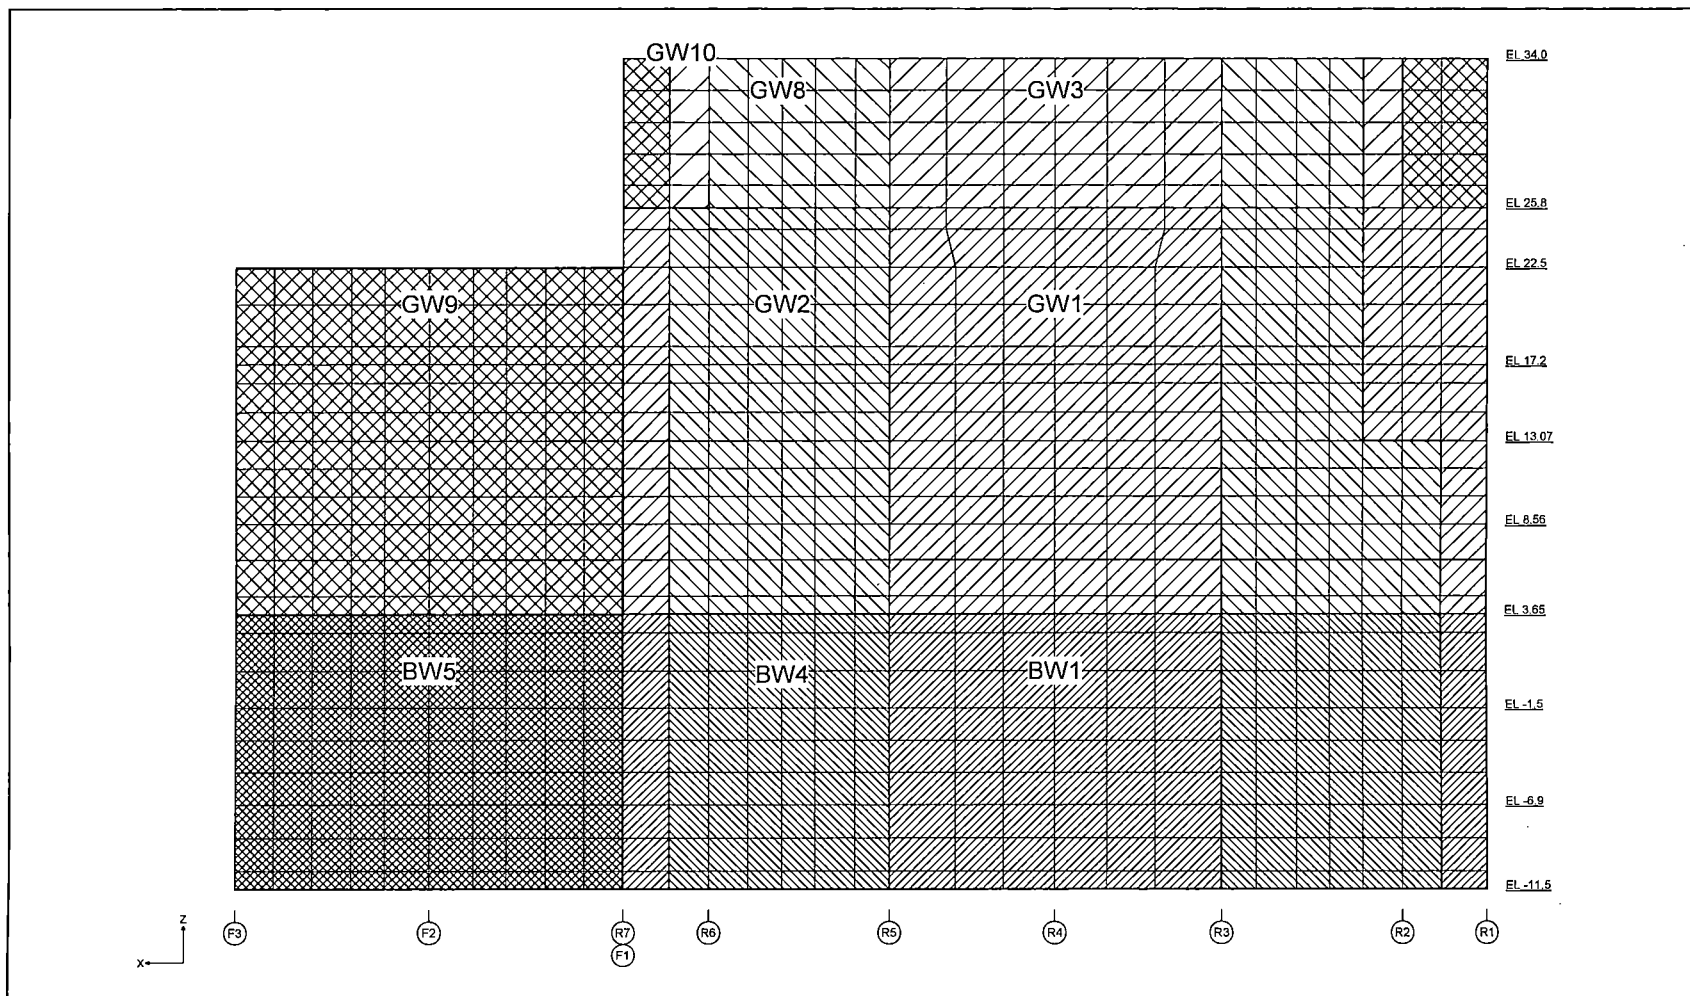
Application of Thermal Load on the External Wall (RA/FA)
